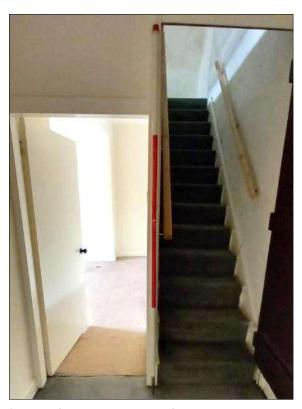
(shot 198): View of staircase to second floor, looking southwest, 2m scale
